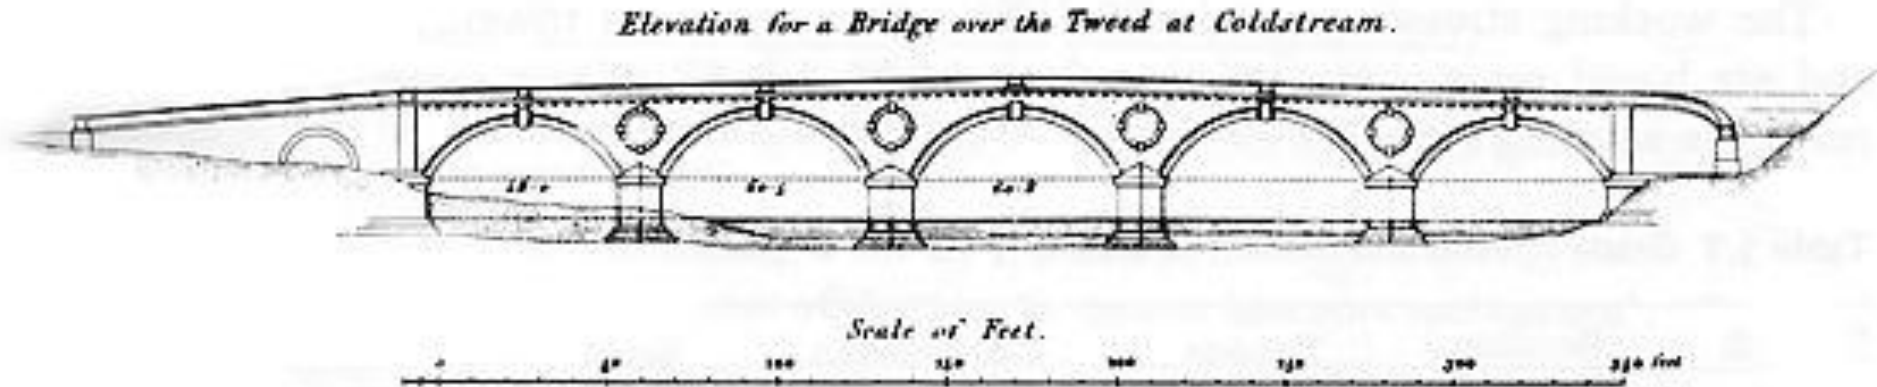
Elevation of masonry Bridge over the Tweed at Coldstream, 1866 (Irwin and Sibbald, 1983)
